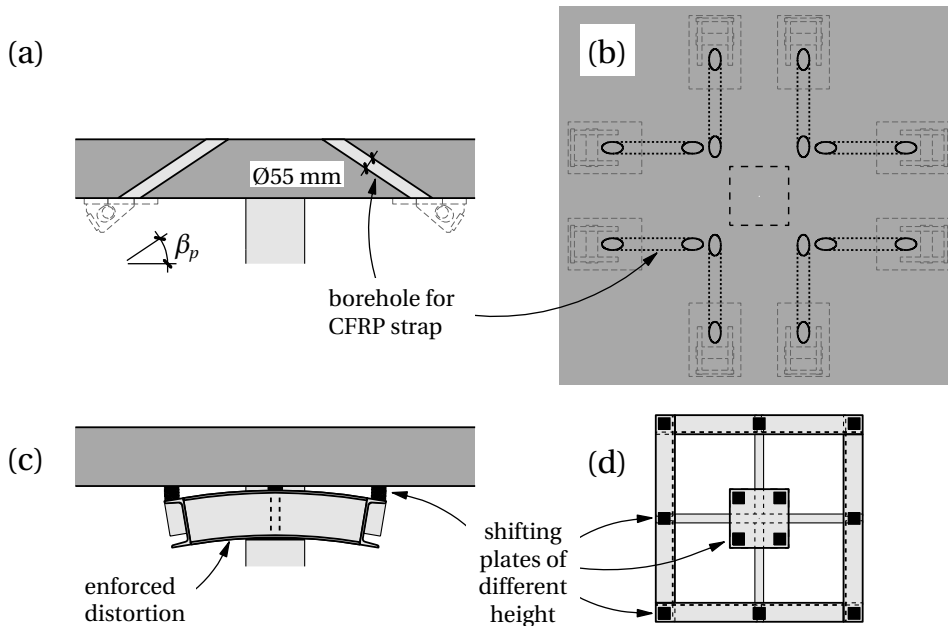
Boreholes for CFRP strap systems: (a) section and (b) plan views. Steel head strengthening system: (c) section and (d) plan views of cut column head
